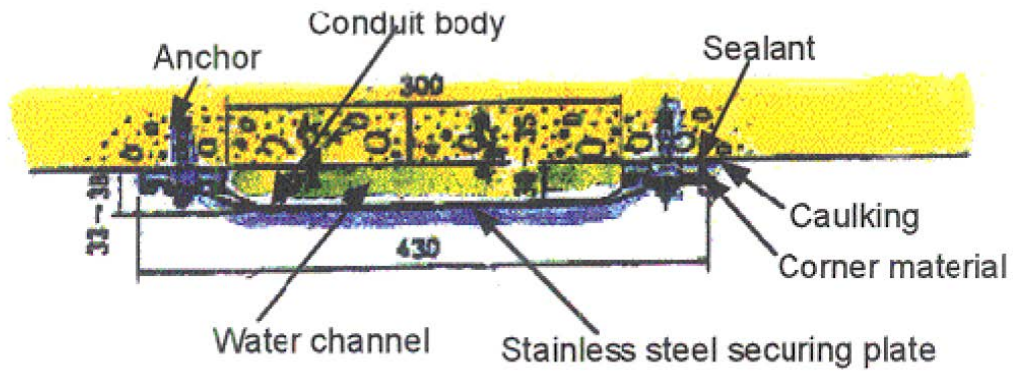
Conduit channel supported by steel securing plate and anchored to concrete roof for conveying water leakage (Russell, 2001)
